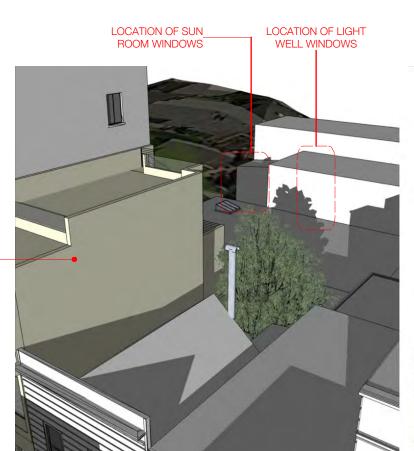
PROPOSED SHADOWS - NOV 1ST, 4:00PM
